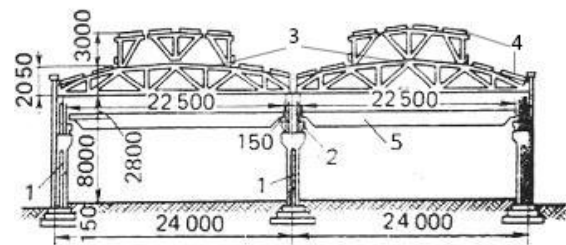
One story precast industrial building: 1 – column, 2 - crane beam (beam that carries rail crane), 3 – RC trusses, 4 - roof panels, 5 - crane
